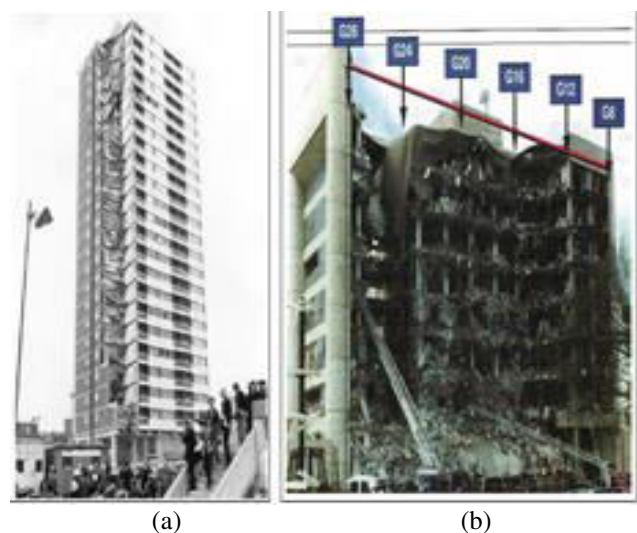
(a) Ronan point building after 16 May 1968 collapse. (b). Murrah Federal Office Building after 19 April 1995 attack.
